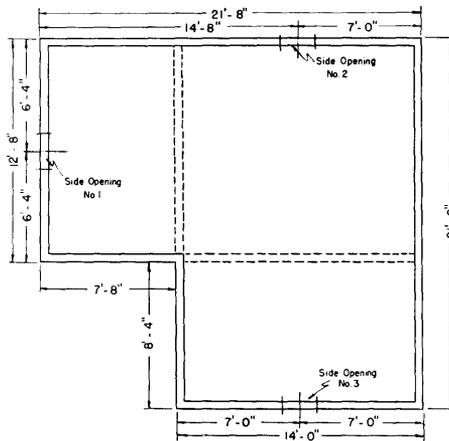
DIAGRAM SHOWING LOCATION OF SIDE WALL OPENINGS USED IN GABLES TO VENTILATE ATTIC FOR TEST SERIES 40-9 TO 40-14, INCLUSIVE.
